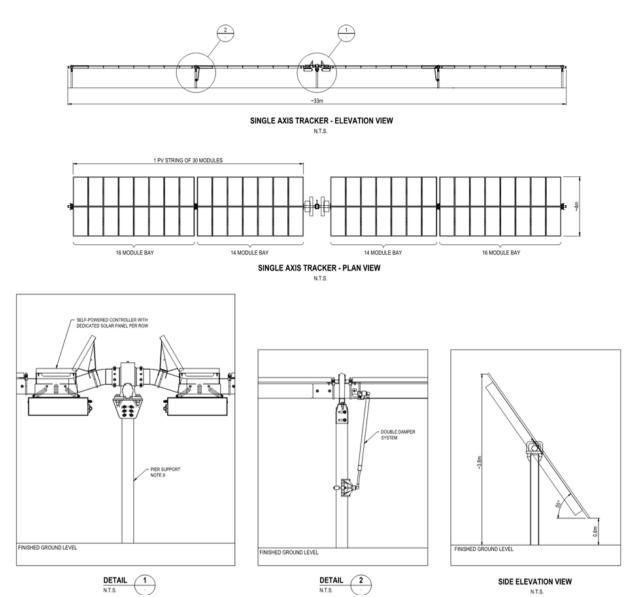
Typical Ground-mounted, Single Access Tracking (SAT) Solar Panel Layout (see Appendix B- Design Drawings for greater detail)
